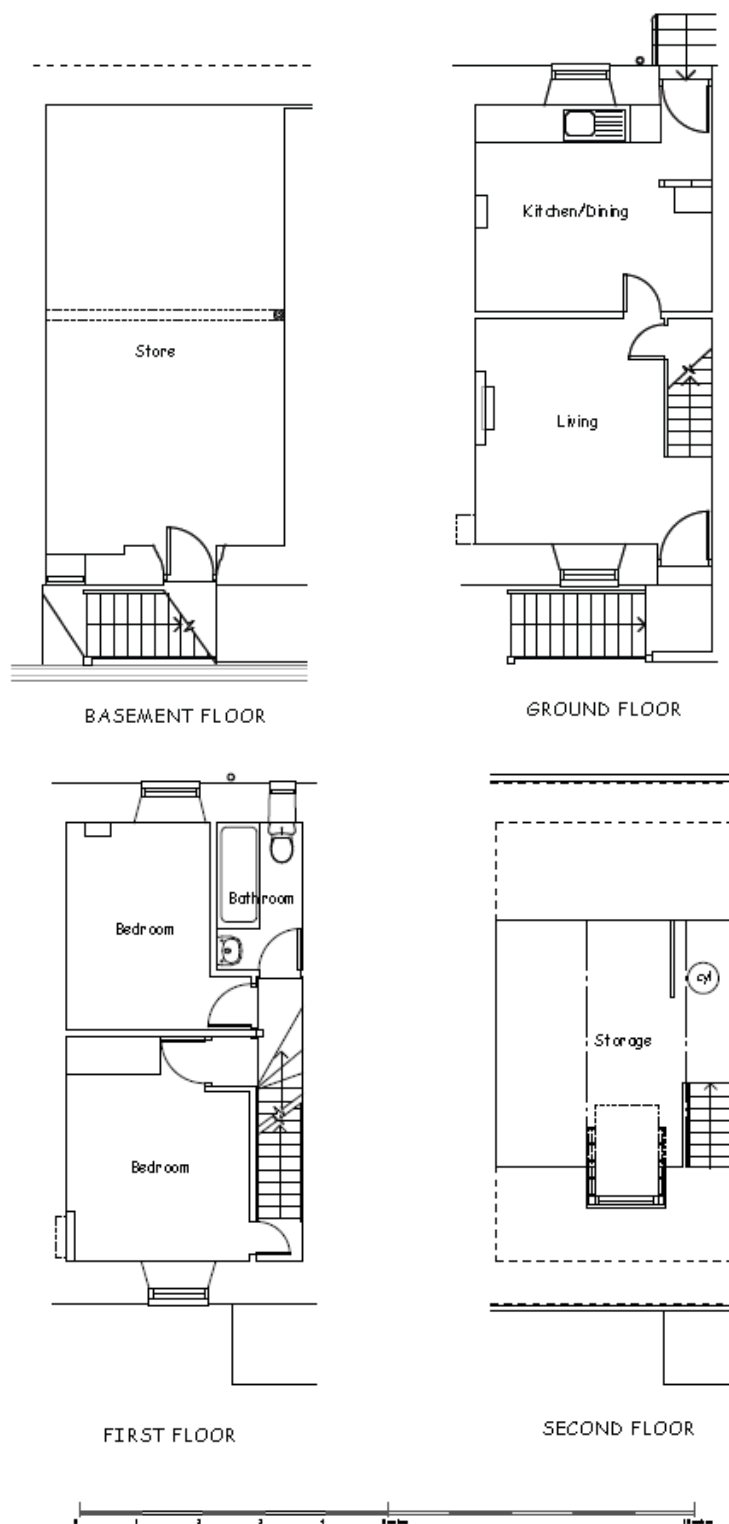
Plans of 14 Teetotal Street, existing (Andrew Williams, Architect, Aug 2011)
